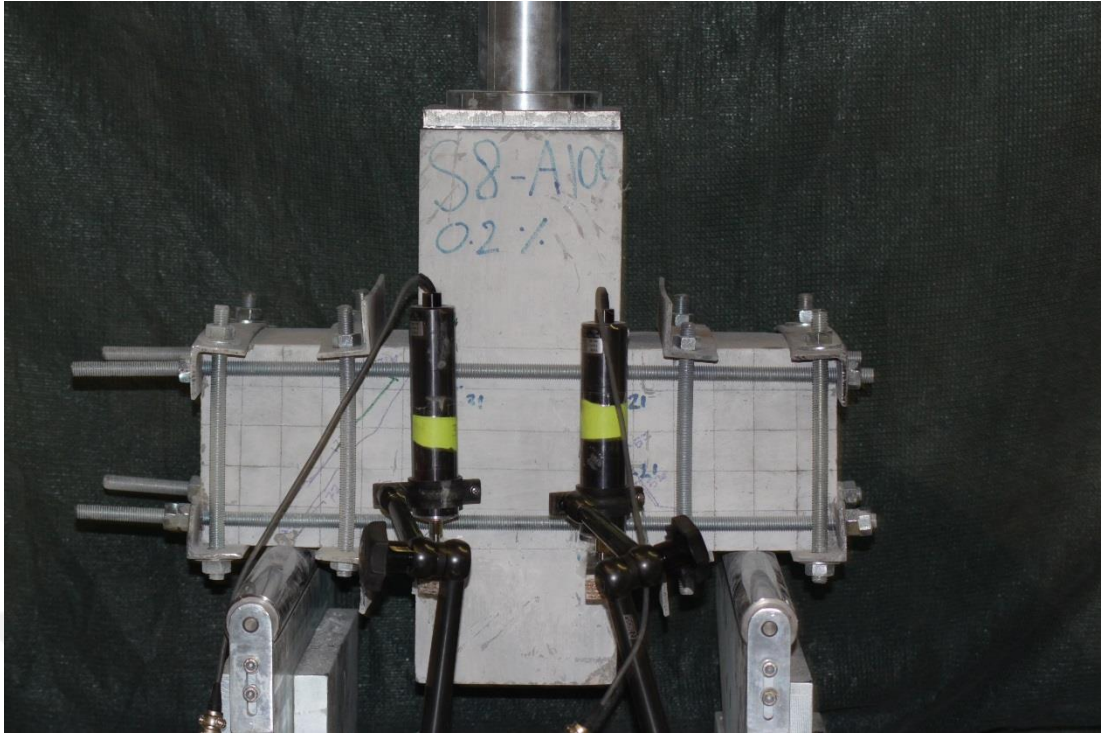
(Specimen S8 - A100 - 0.2%) in the test machine
